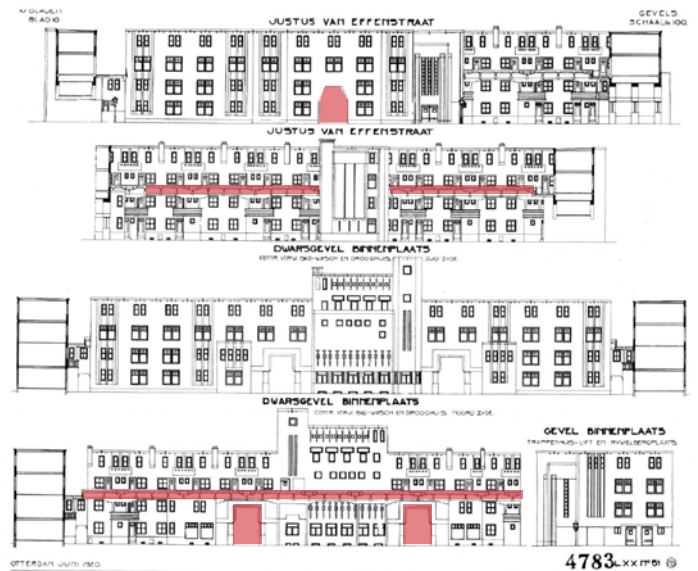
Sections, Spangen, Rotterdam [source: Hidden Architecture, 2015]
